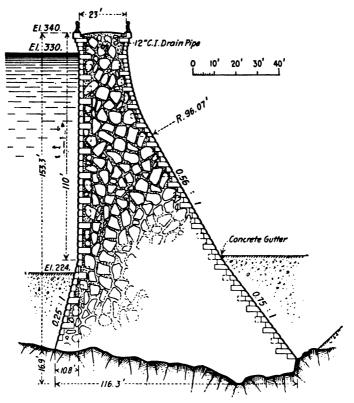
Section of Cross River dam, New York; built 1905 to 1907; cyclopean masonry; concrete block face; length of top 986.5 ft.; max. height above foundation 170 ft.; contains 158,467 cu. yd.; masonry all kinds.
